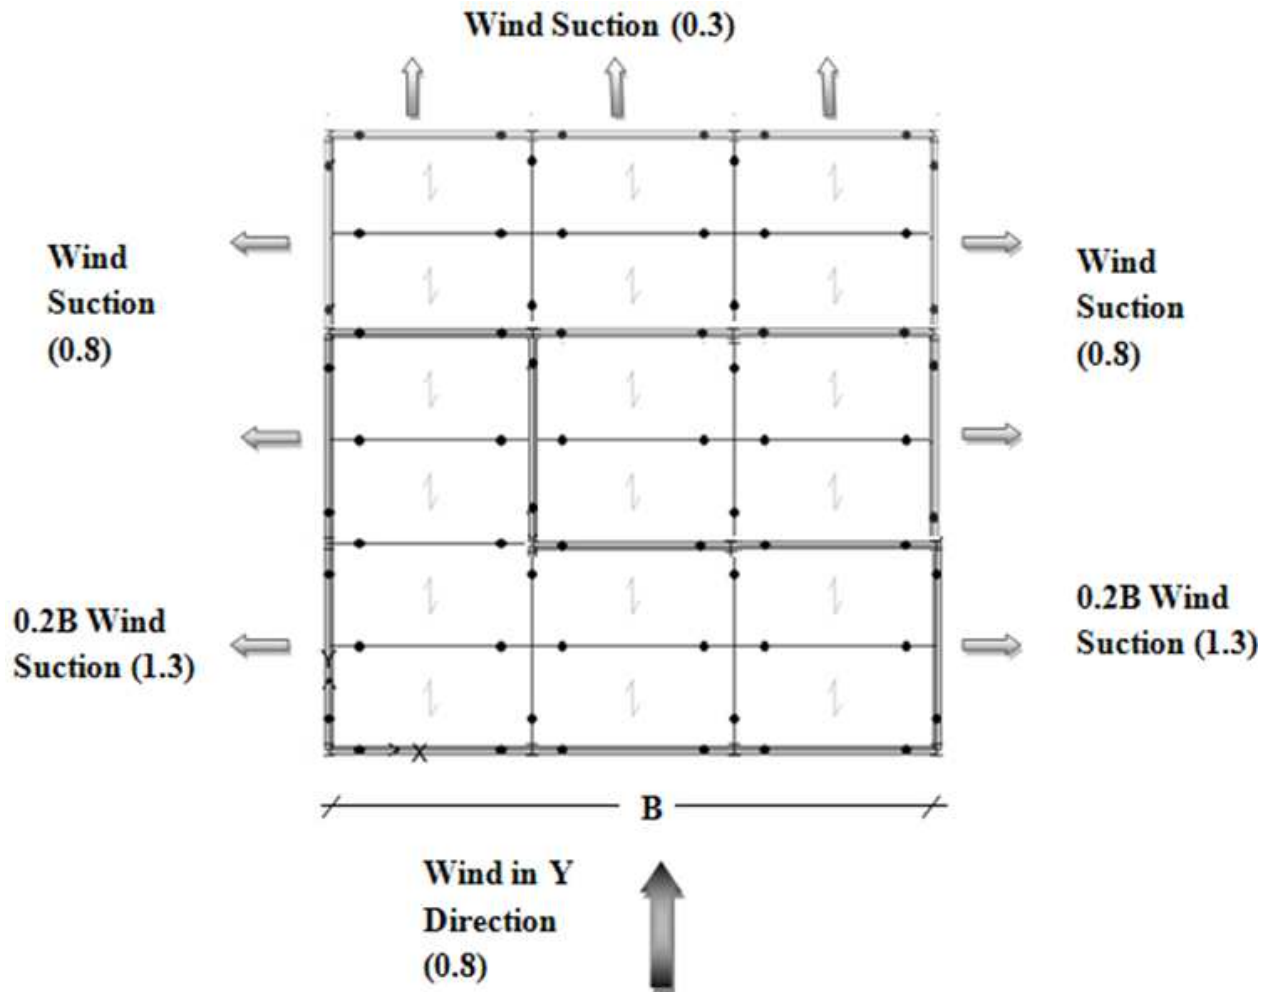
(b): Building layout indicating wind in Y direction with suctions for symmetrical plan and asymmetrical section.
